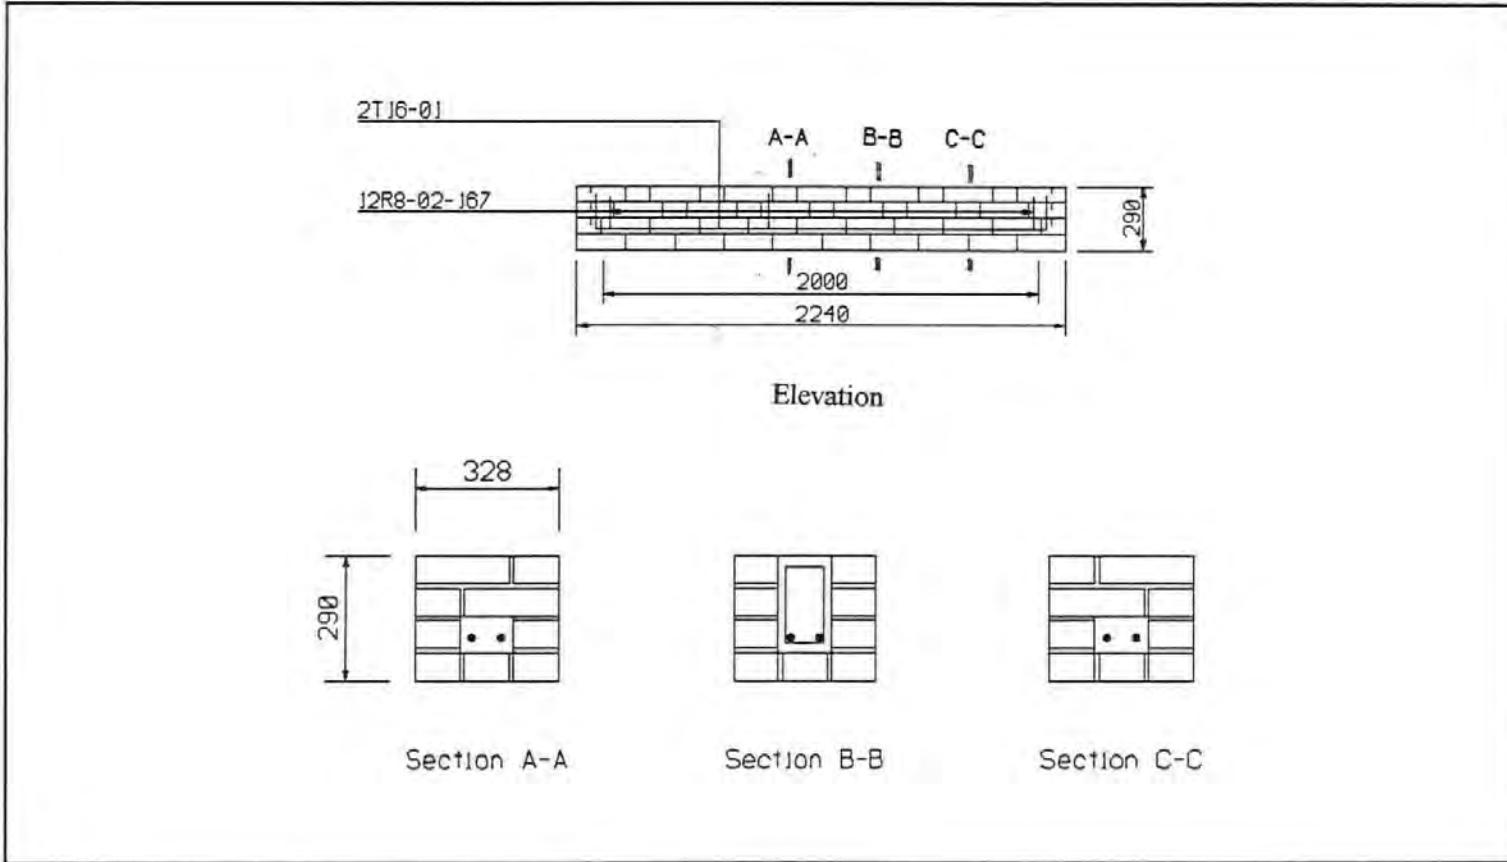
Details of 2m Span UOP Quetta Style Test Beam
